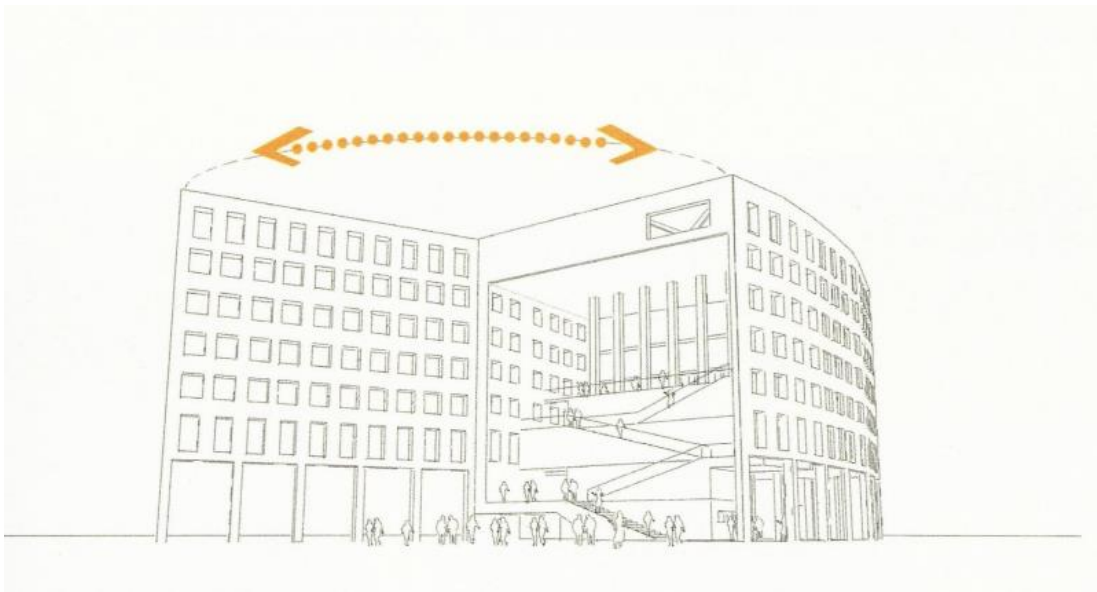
Transformation of the Concrete Perforate Wall Façade into a Transparent Facade by TEGET Architecture Office
